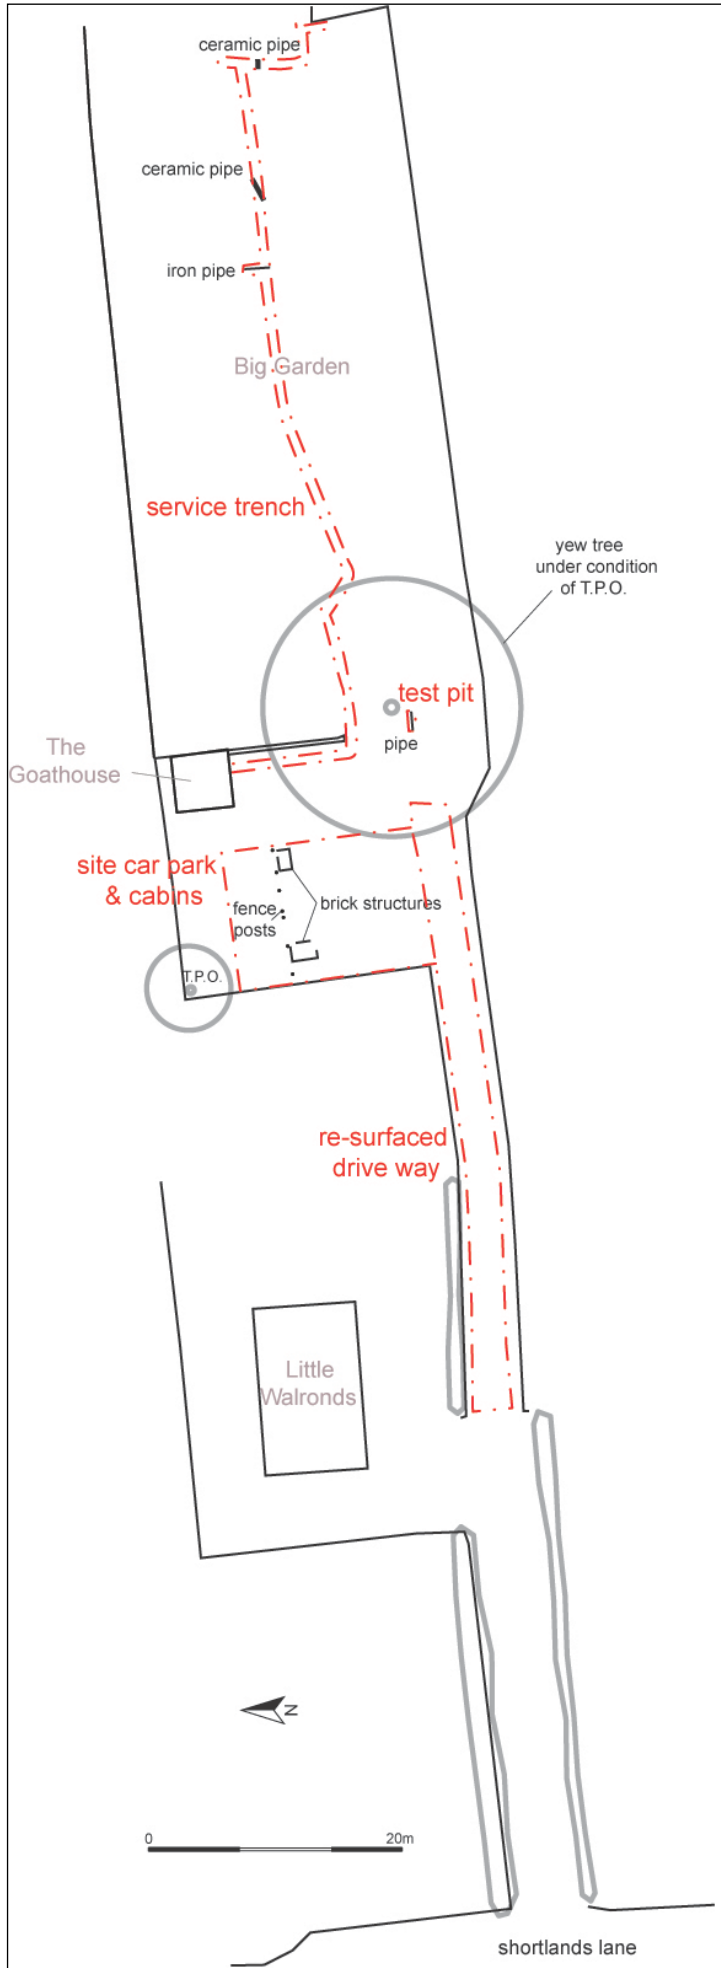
Plan of west end of site; showing the car park, driveway and western end of the service trench.
